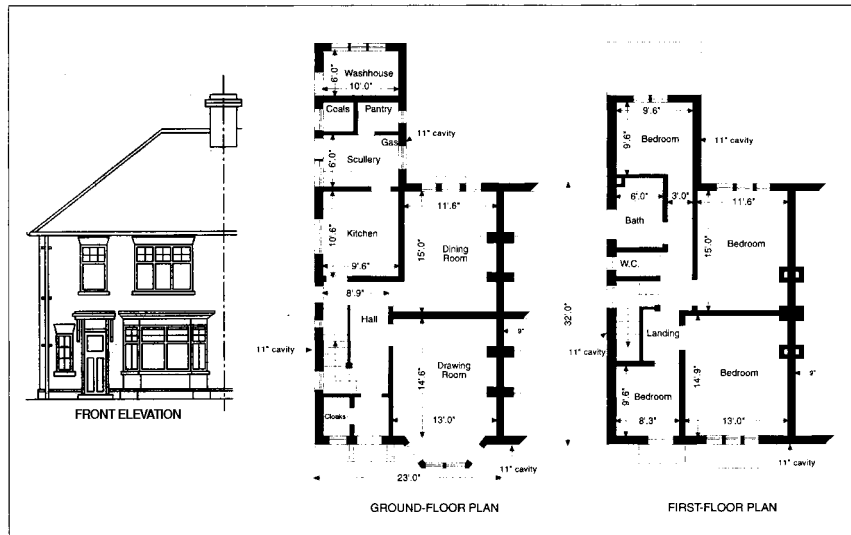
Front elevation and plan of No. 31 Southlands, High Heaton, Newcastle upon Tyne
